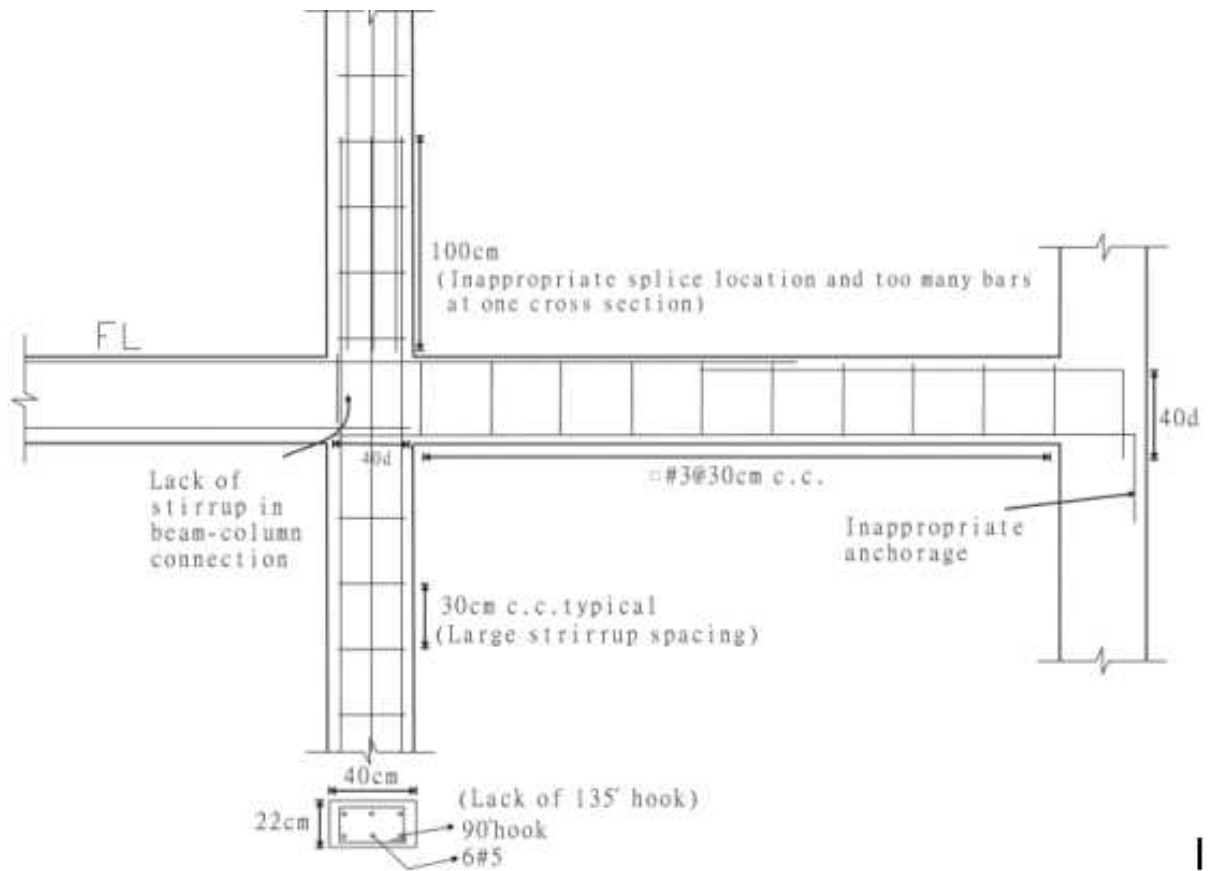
Critical Structural Details - RC Frame Reinforcement Details
